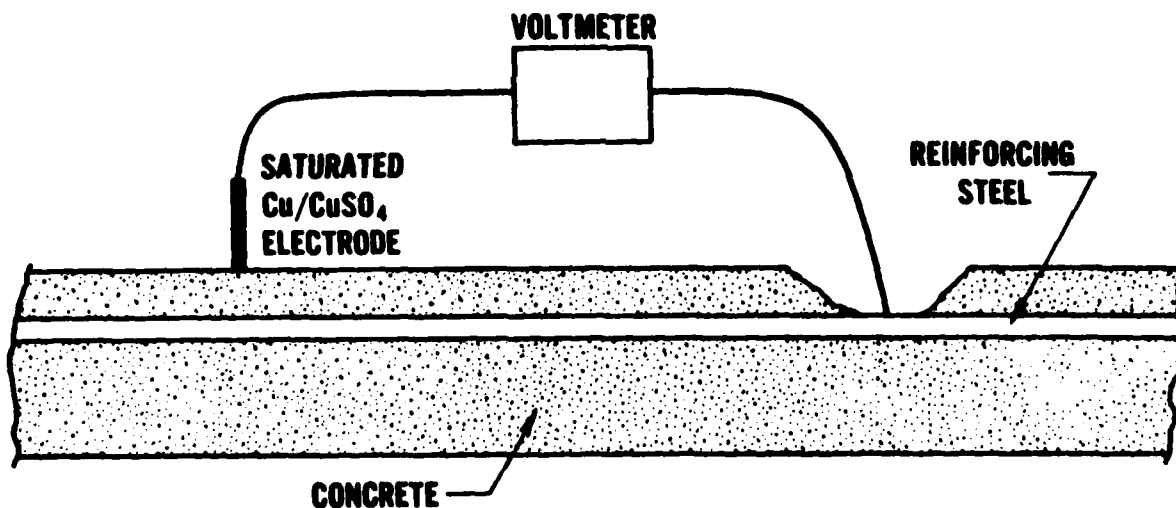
Measurement of electrical potential of steel reinforcing bars in concrete.
